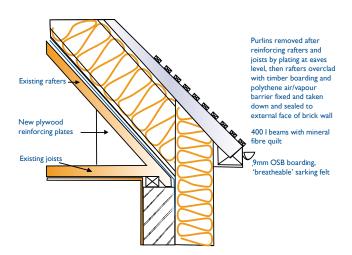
At Grove Cottage, the 400 mm thick roof insulation connects at the eaves to 250 mm thick external wall insulation. Image courtesy of Simmonds Mills Architects.
